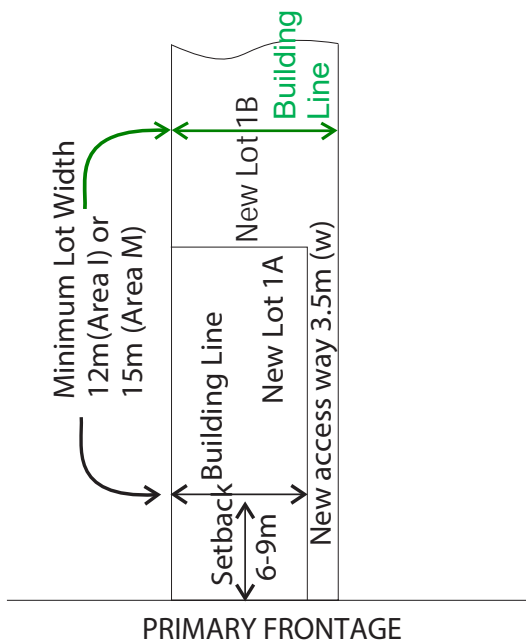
(b): Minimum lot width required at the primary street frontage boundary for all allotments.(l)
